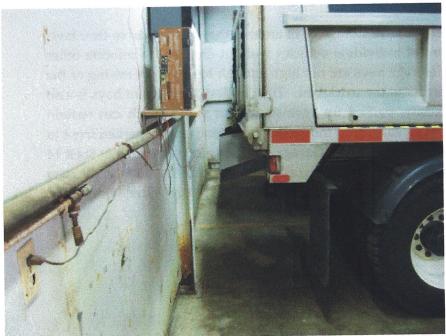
Limited clearances endanger wall surfaces, building structure and wall mounted utilities as well as limiting passage of personnel.
